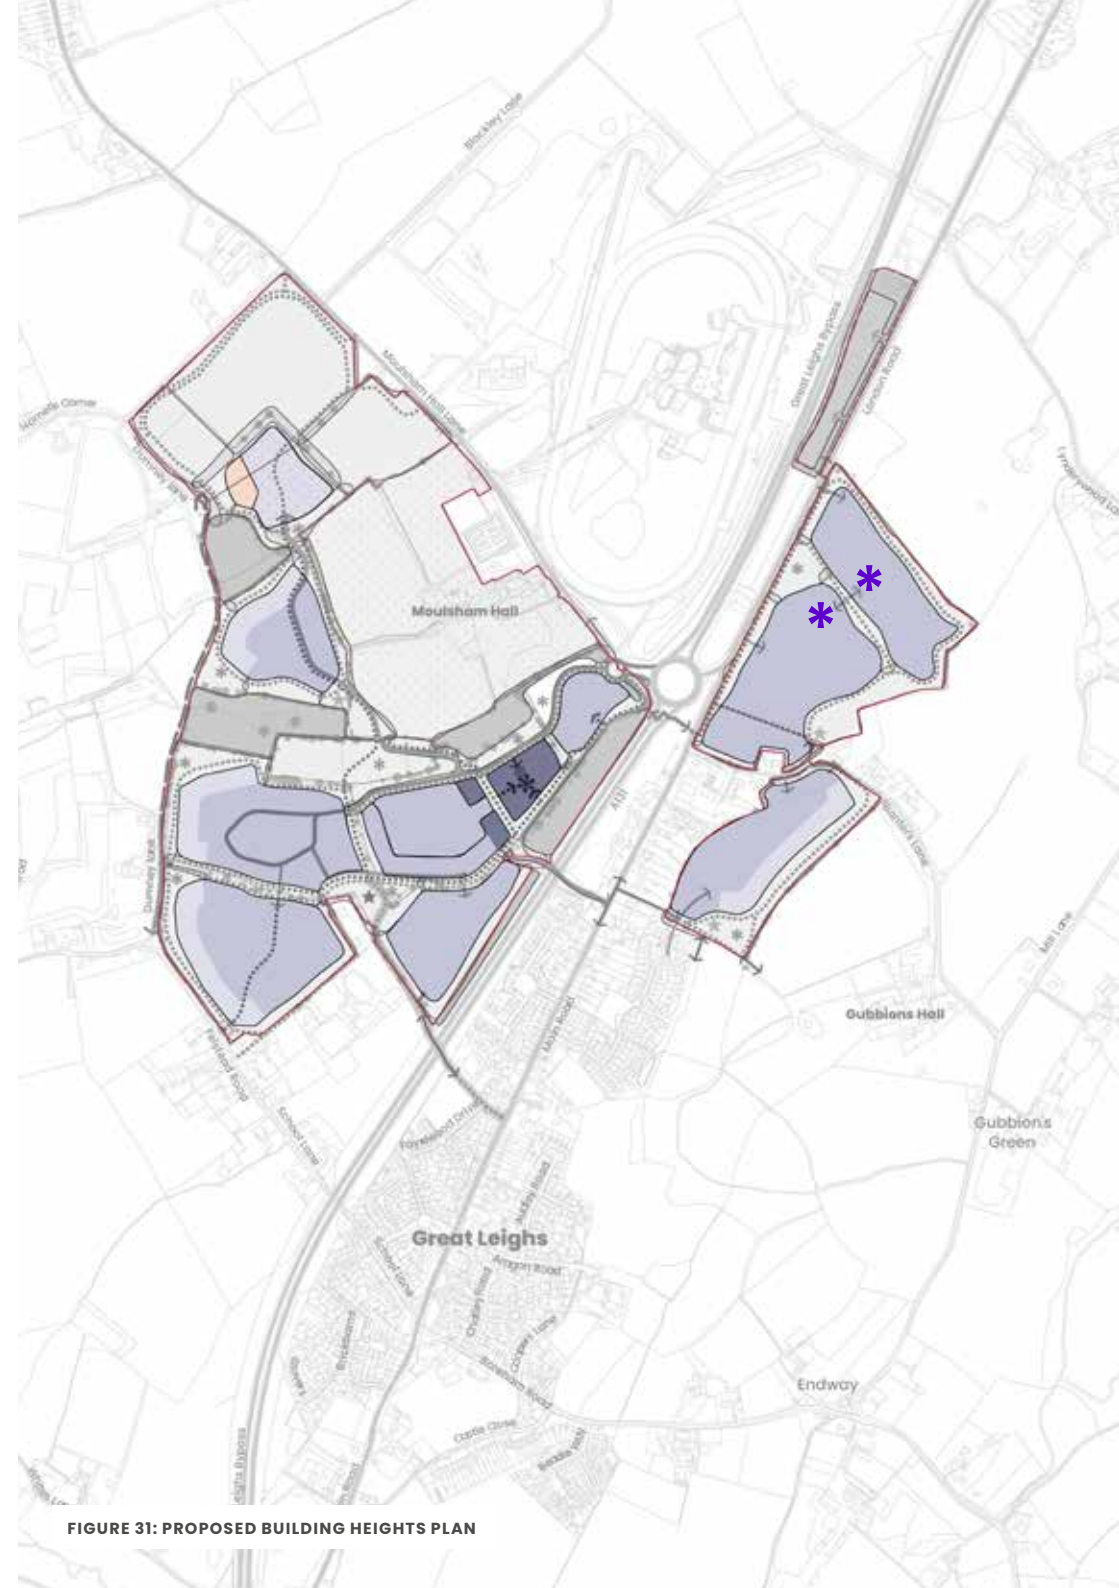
PROPOSED BUILDING HEIGHTS PLAN
